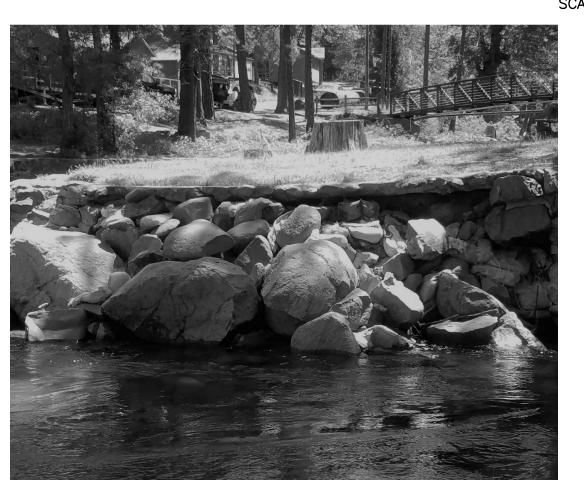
EXISTING SOUTH POOL STONE RETAINING WALL
